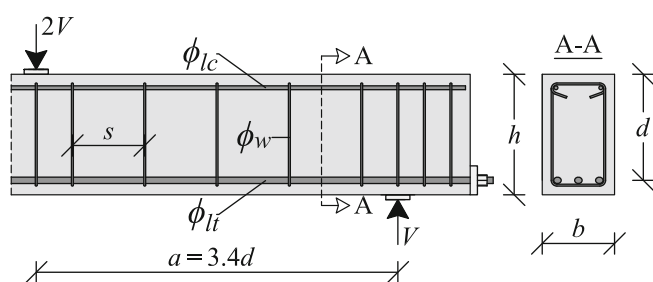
Test setup and details of the geometry and the reinforcement layout.
